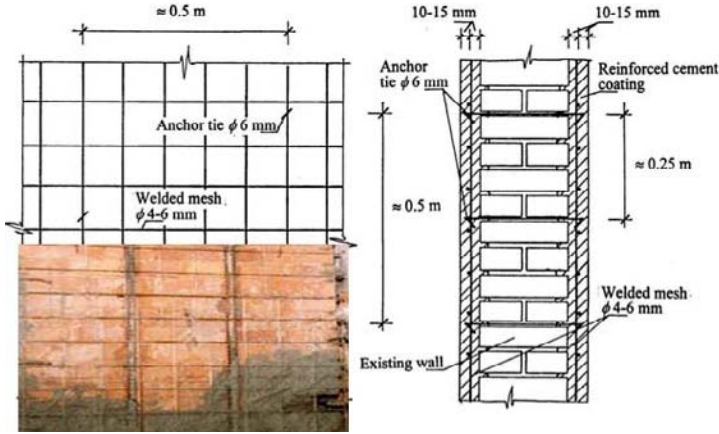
Application of reinforced cement coating on brick-masonry walls.
